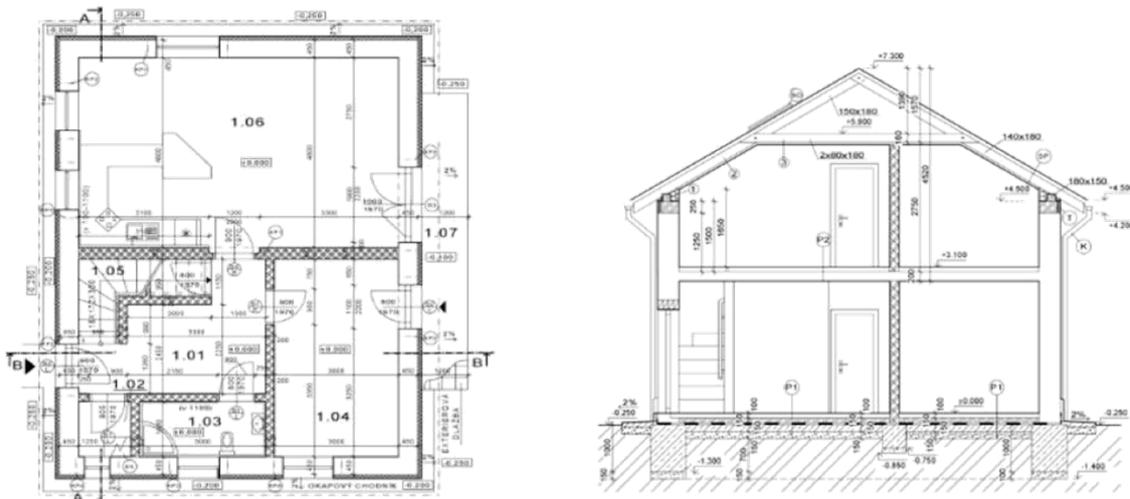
Proposed Floor Plan & Section B-B [Not to Scale]
